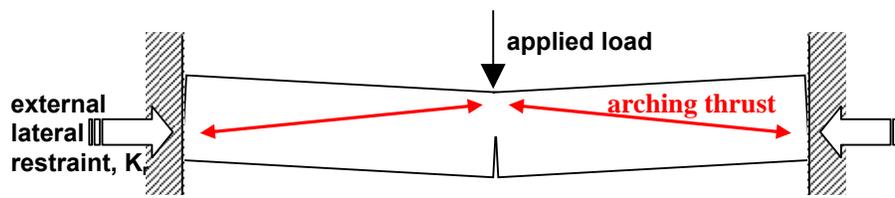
Compressive membrane action in laterally restrained reinforced concrete slab
